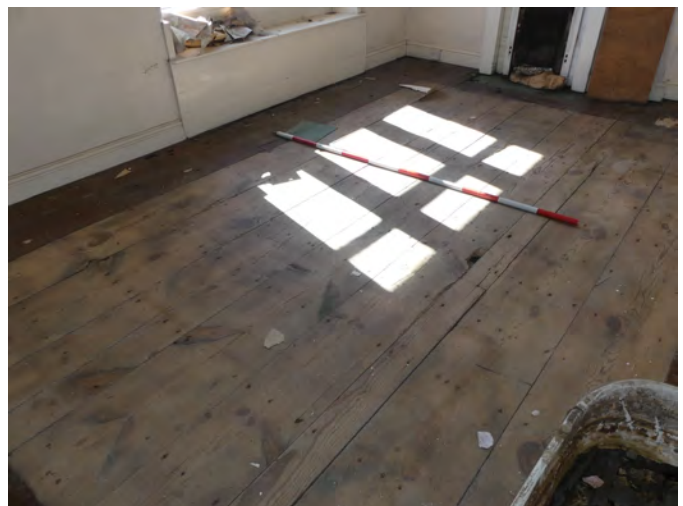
(right): Floor in F8 (farmhouse), viewed from the north
